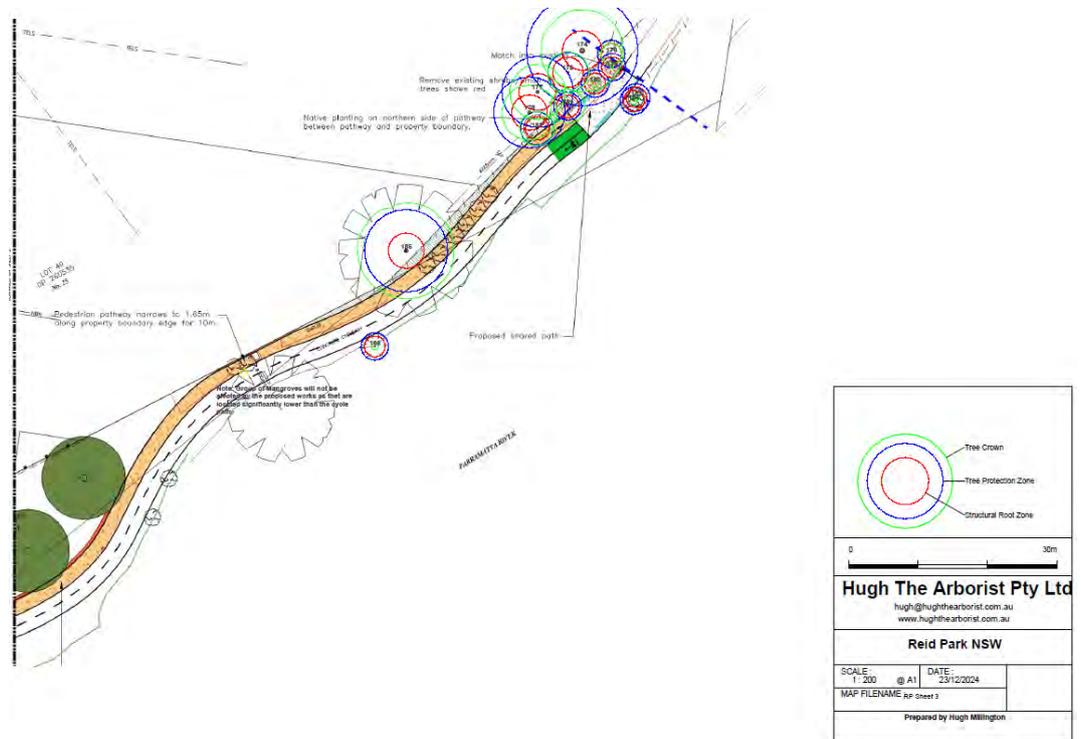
Site Plan (Sheet 3). Source: Hugh The Arborist
